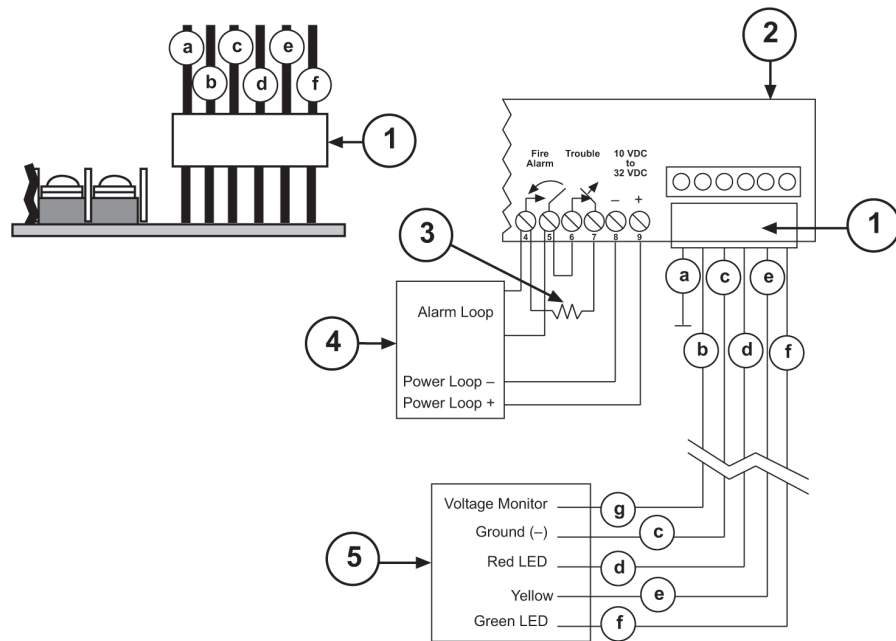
Connecting a D344-RL Remote Indicator Plate
